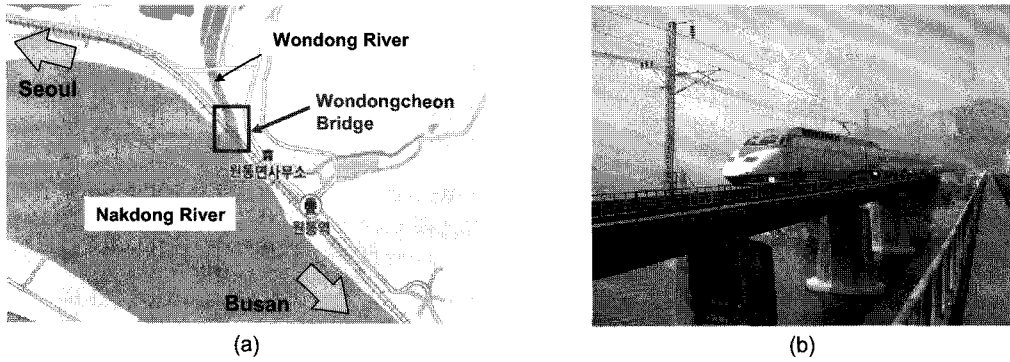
Wondongcheon railway bridge; (a) Bridge location, (b) Real view
